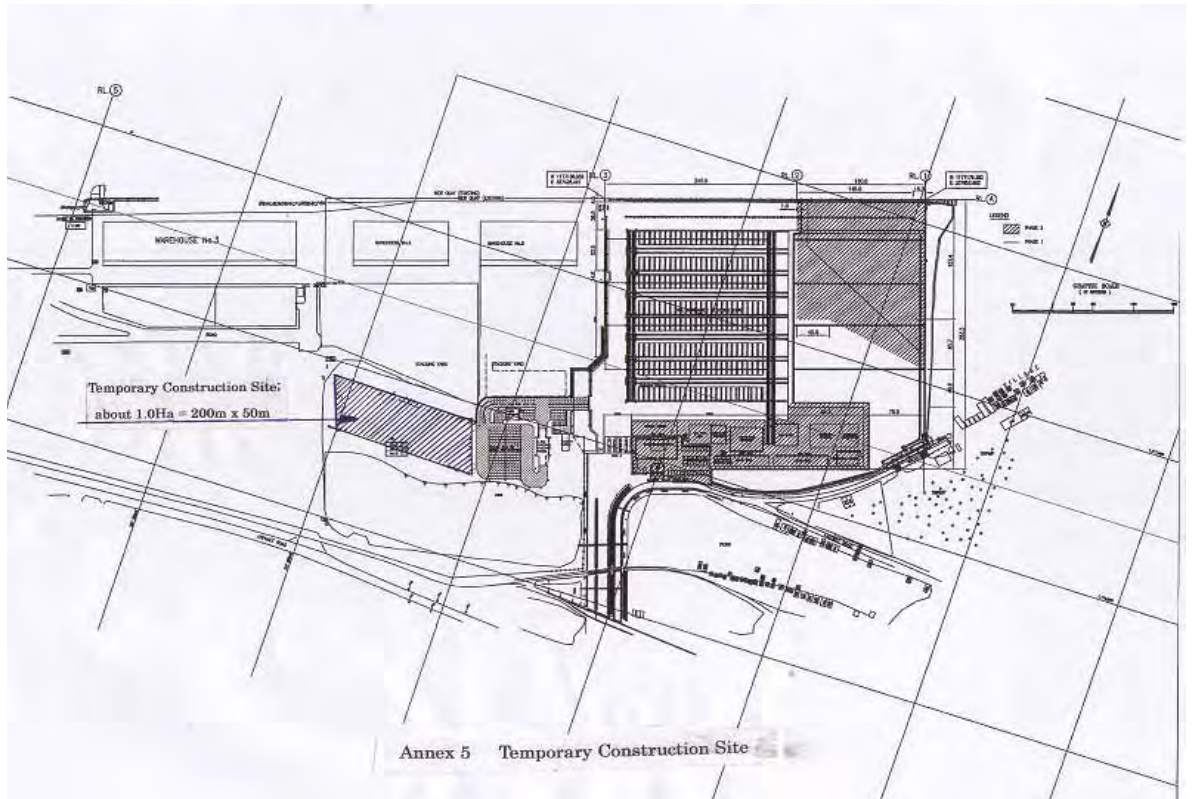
Temporary Construction Site of Sihanoukville Port
